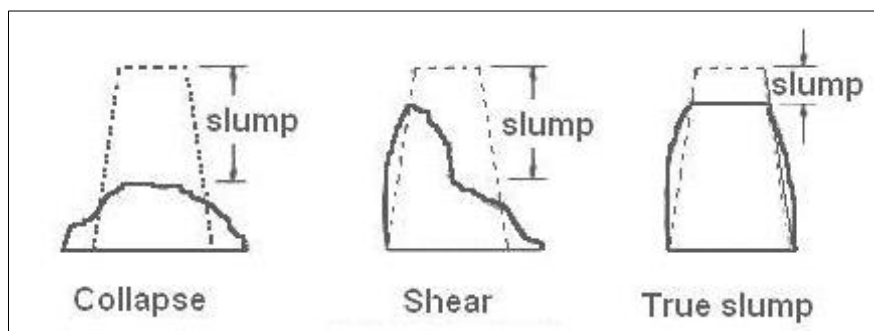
Three types of a concrete slump (CEP, 2018)
